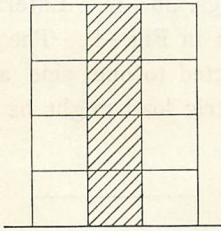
e Frame with four Panel Walls (Specimen-4)
